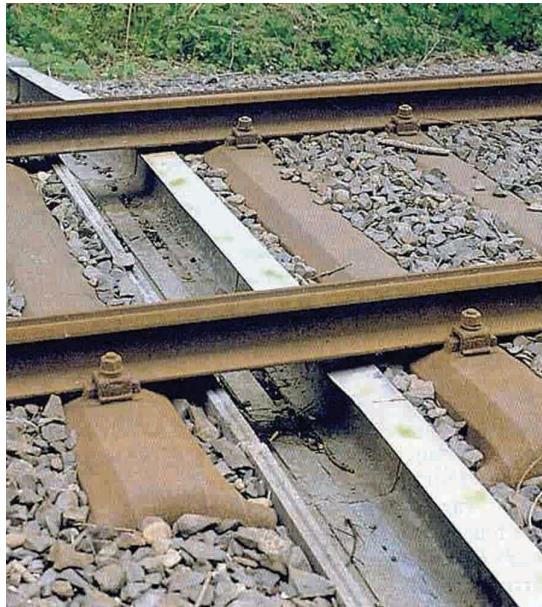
For amphibians and other small animals, half-pipes can be used as passages under the rails where larger tunnels are not possible. (Photo by U. Bolz)
